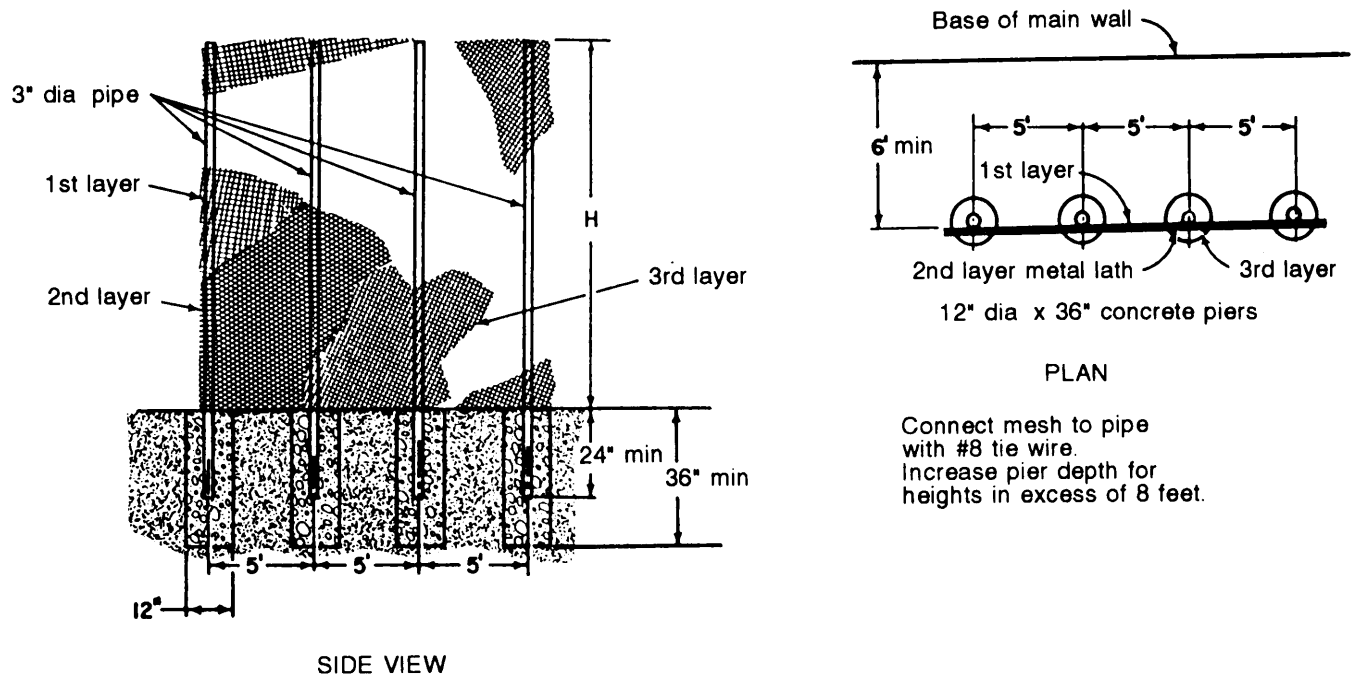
Standoff construction using expanded metal lath - Condition II
